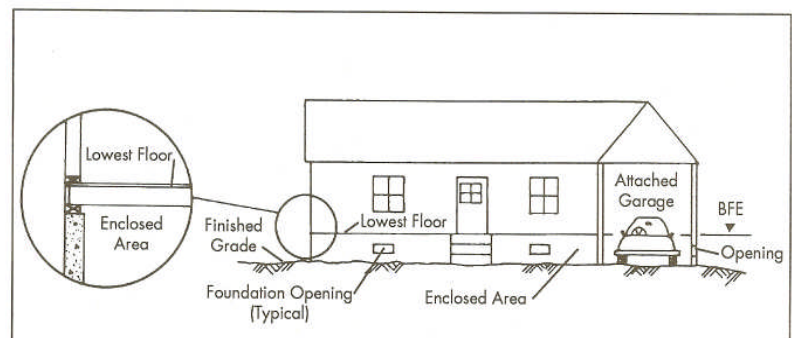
Compliant Residential Building Built on Solid Foundation Walls With Attached Garage
